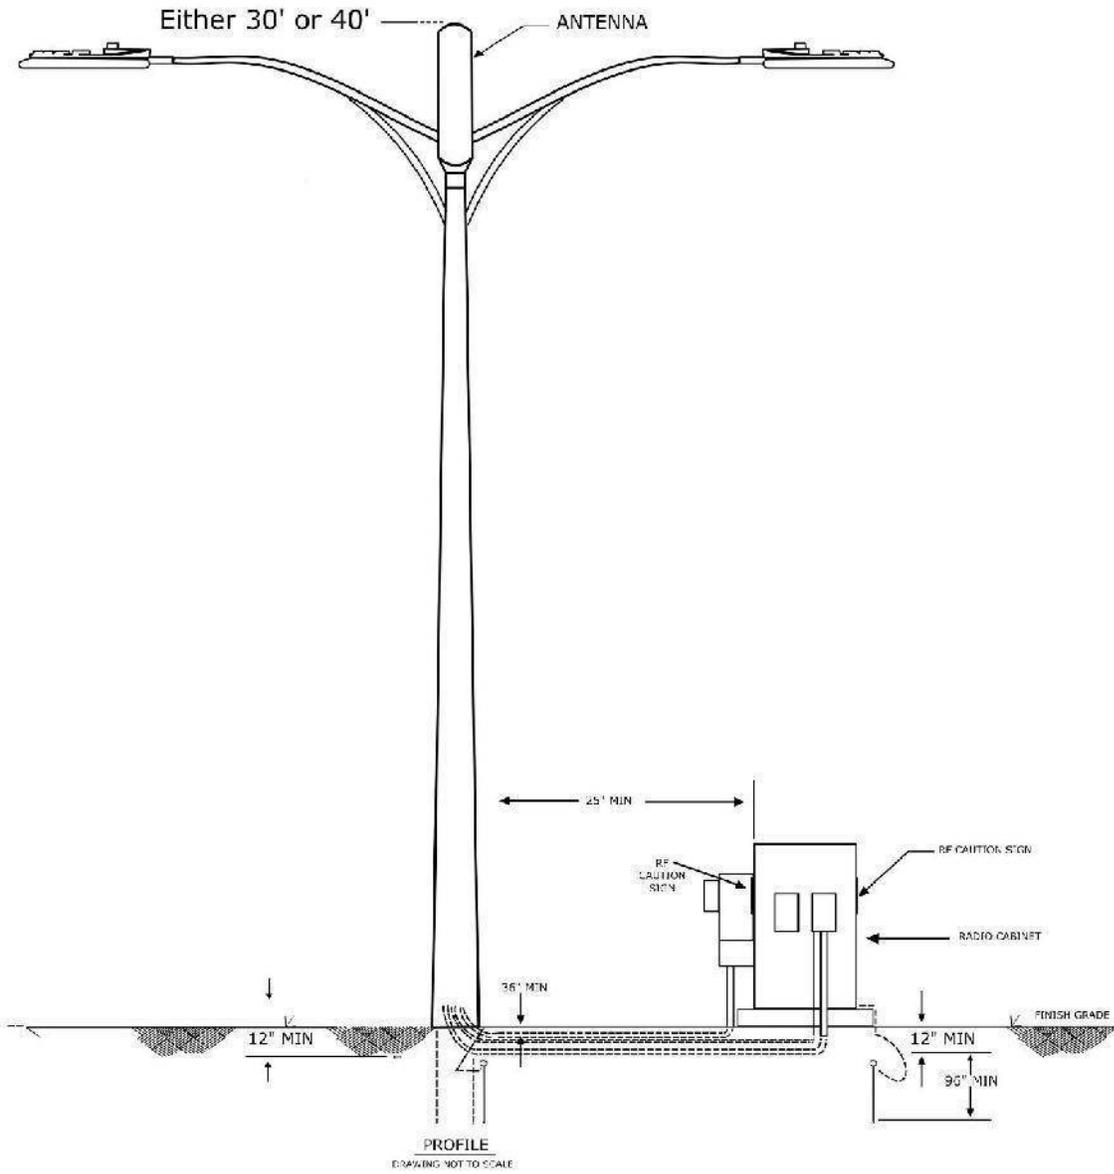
30-foot or 40-foot Streetlight Pole with Antenna on Top and Dual Cobra Head and Slab-Mounted Equipment Cabinet
